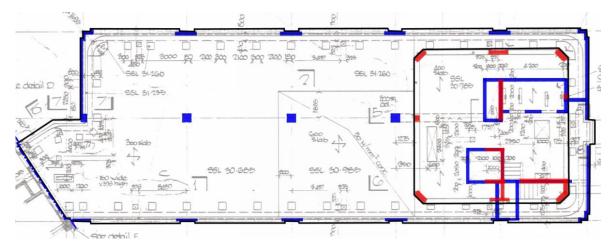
Existing Saffron Hill roof. Structure below in blue and structure above to upper roof in red.
